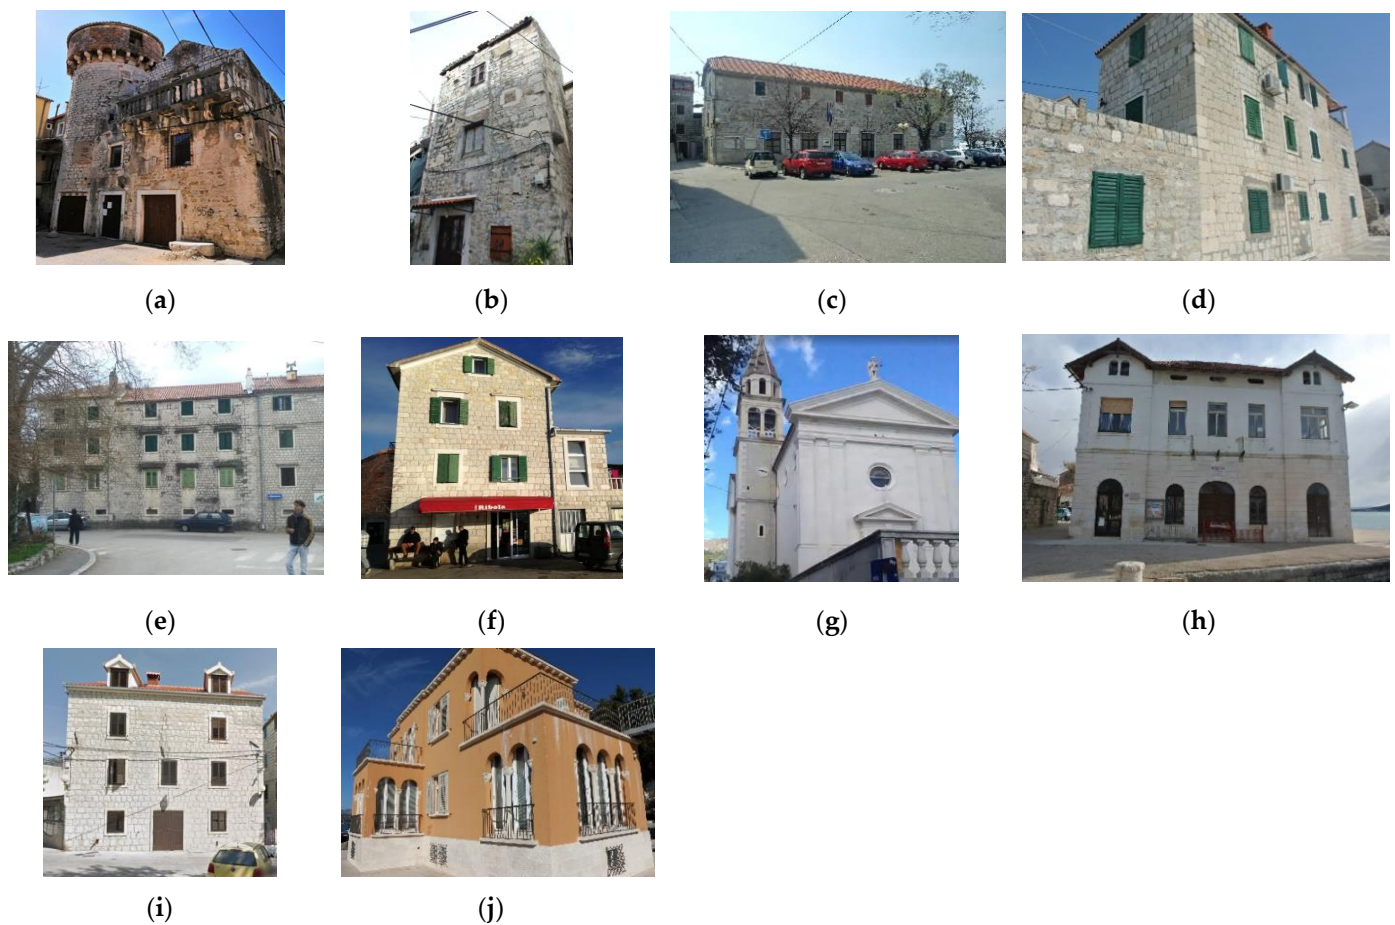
Analyzed buildings in the historical centre: (a) Cambi Tower; (b) Cumbat Towers; (c) Public Library; (d) Folk Castle; (e) Dudan Palace; (f) Perišin house; (g) St. Mihovil Church; (h) rowing club; (i) residential building; (j) ballet school.
